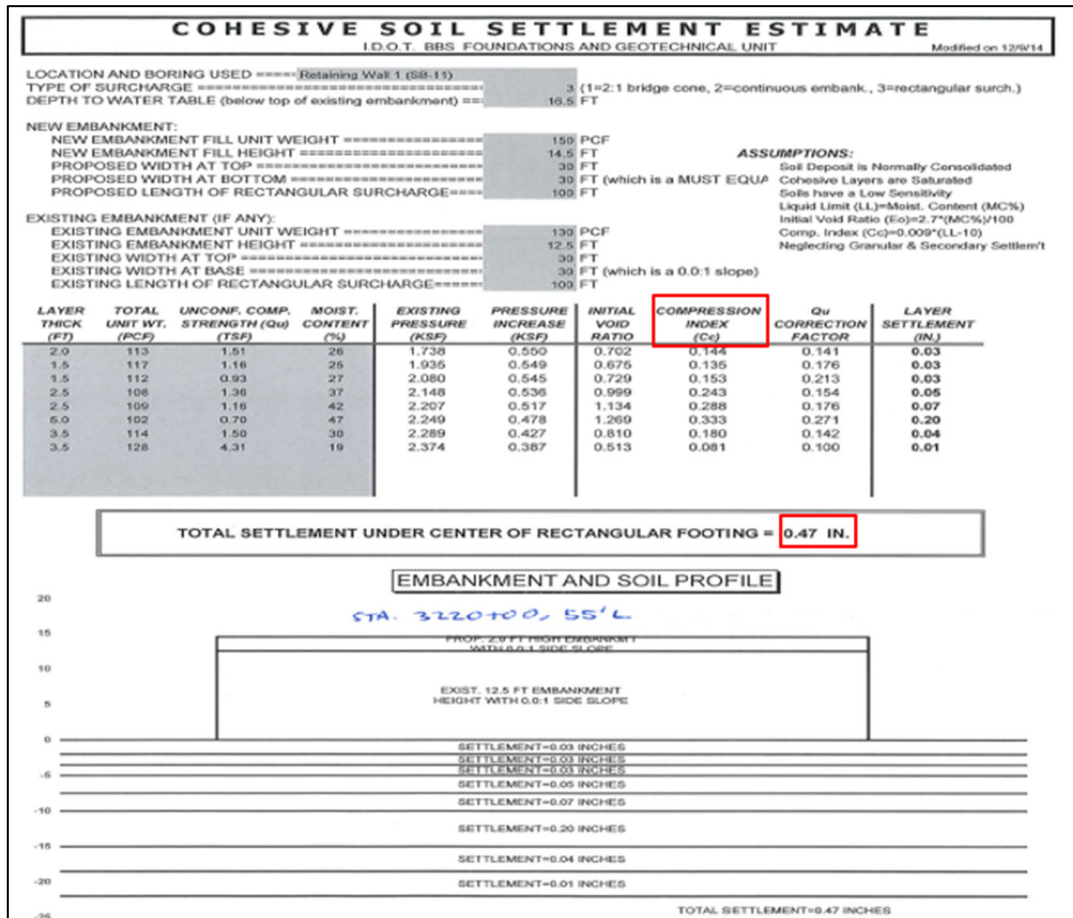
Settlement estimation for pavement next to Retaining Wall #1.
